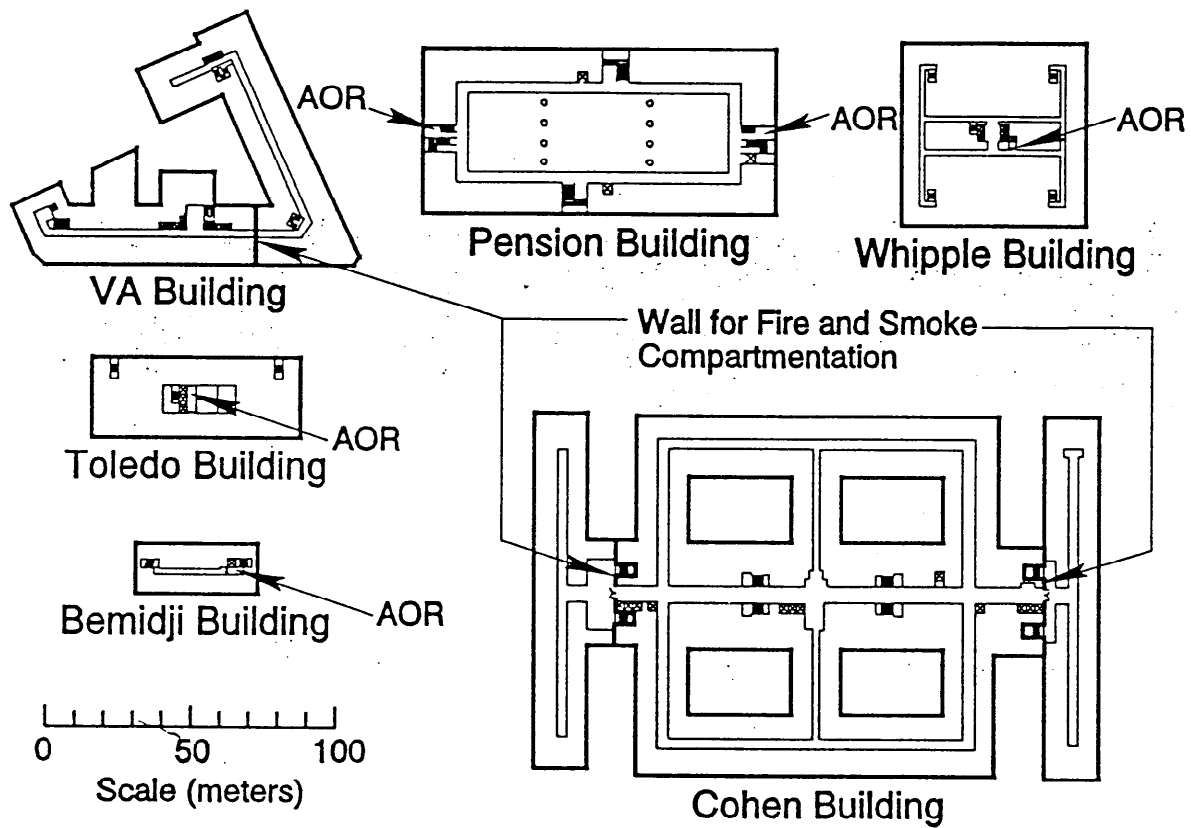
Typical floor plans of the buildings retrofitted with horizontal separation and AORs.
